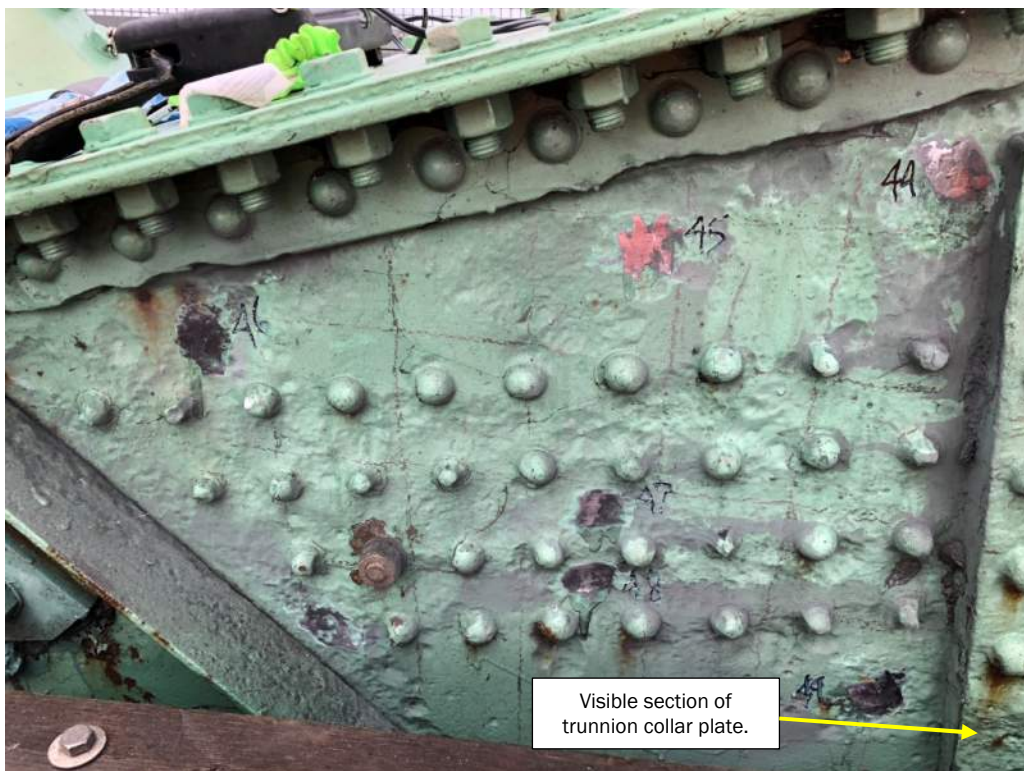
The north (roadway) side of the south trunnion has widespread pitting in the collar plate (right side), connection plate (left side) and some rivet heads (photo by Brouco NDT).
